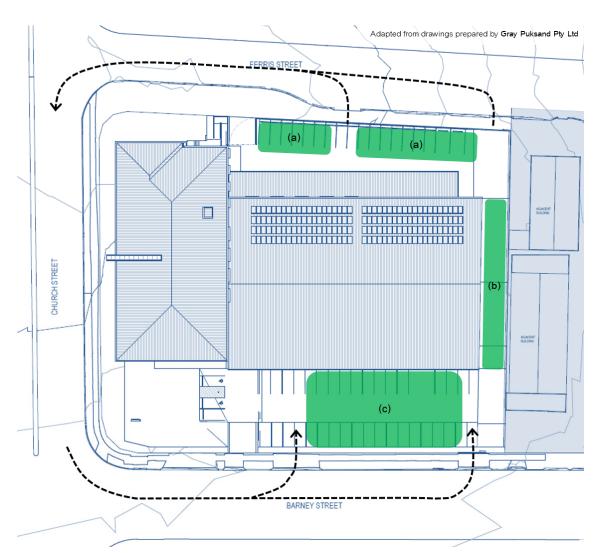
Potential locations, in green, for on-site storage of waste during construction of laneway (a) and main building (b & c). Location (c) will be used to store excavated spoil prior to use as engineered fill. Locations based on anticipated construction vehicle traffic patterns (dashed black lines).
